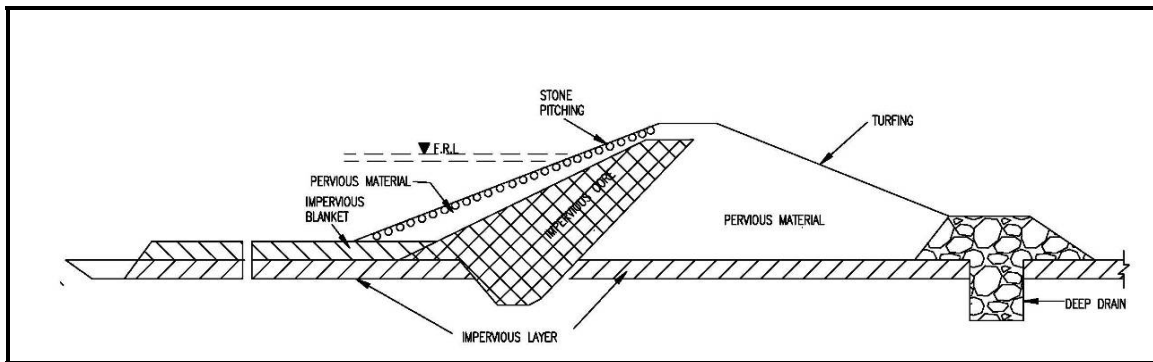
Typical Earth Dam Section with Foundation Pervious to Large Depth
